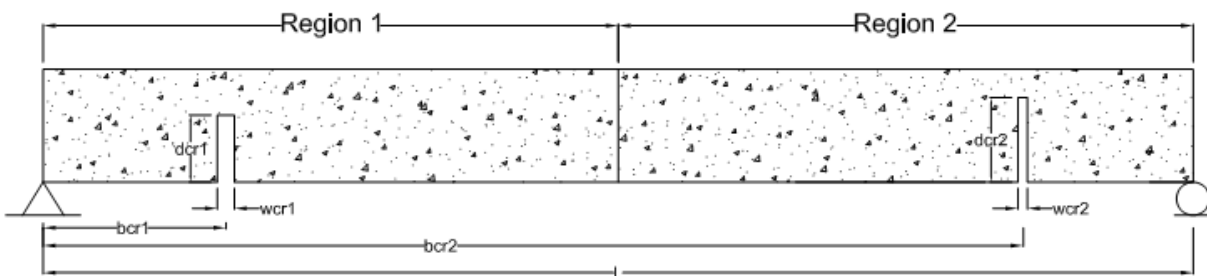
Elevation view of a sample concrete beam with two cracks
